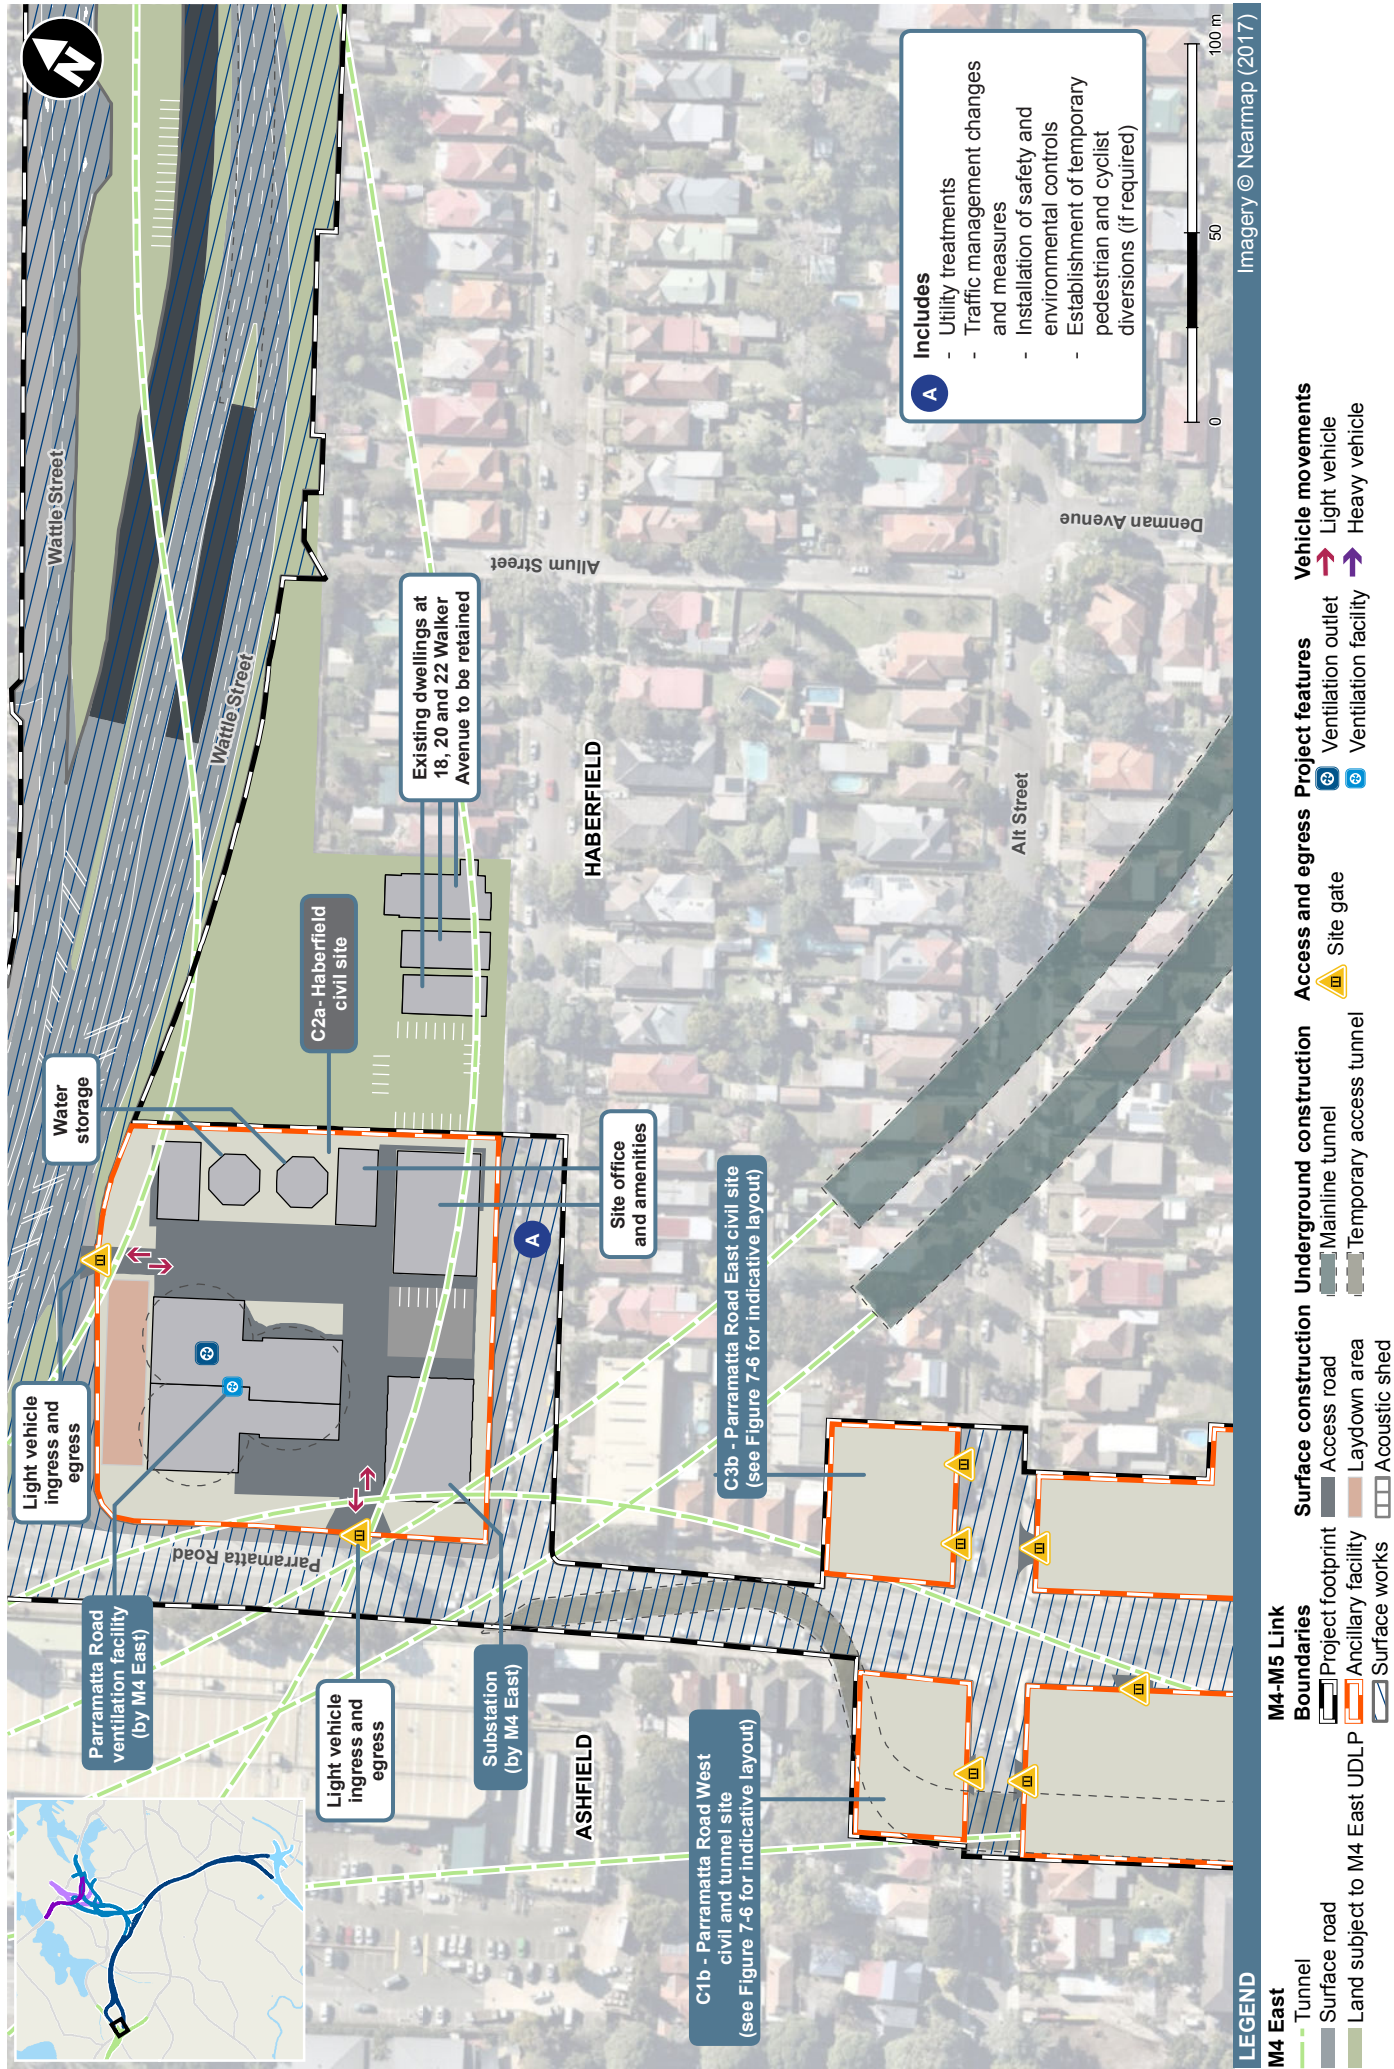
Indicative Haberfield civil and tunnel site (C2b) layout
